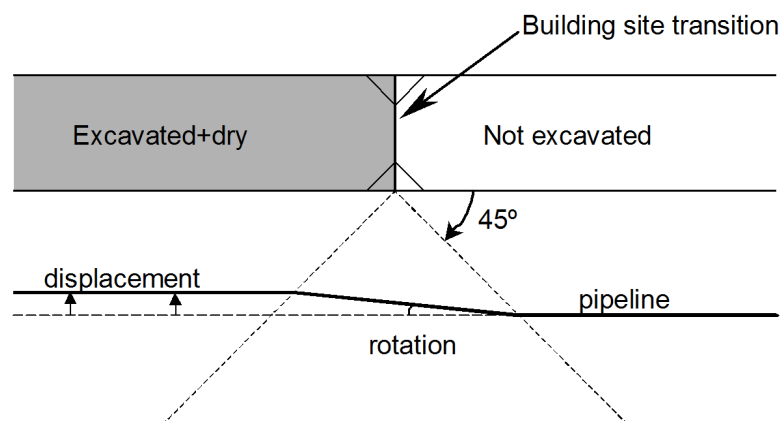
Displacement and rotation of a pipe near a building site excavation (top view)
